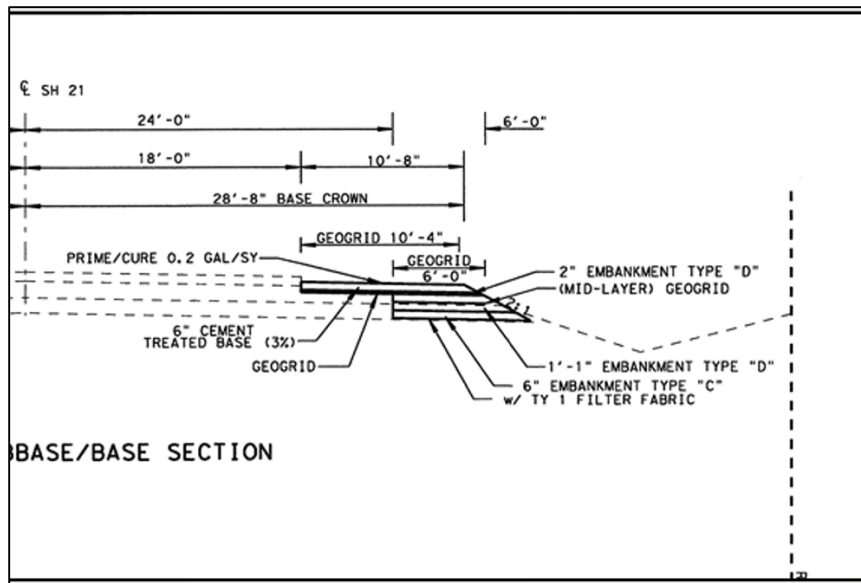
Pavement section from design plans for SH-21, Bastrop, Texas
